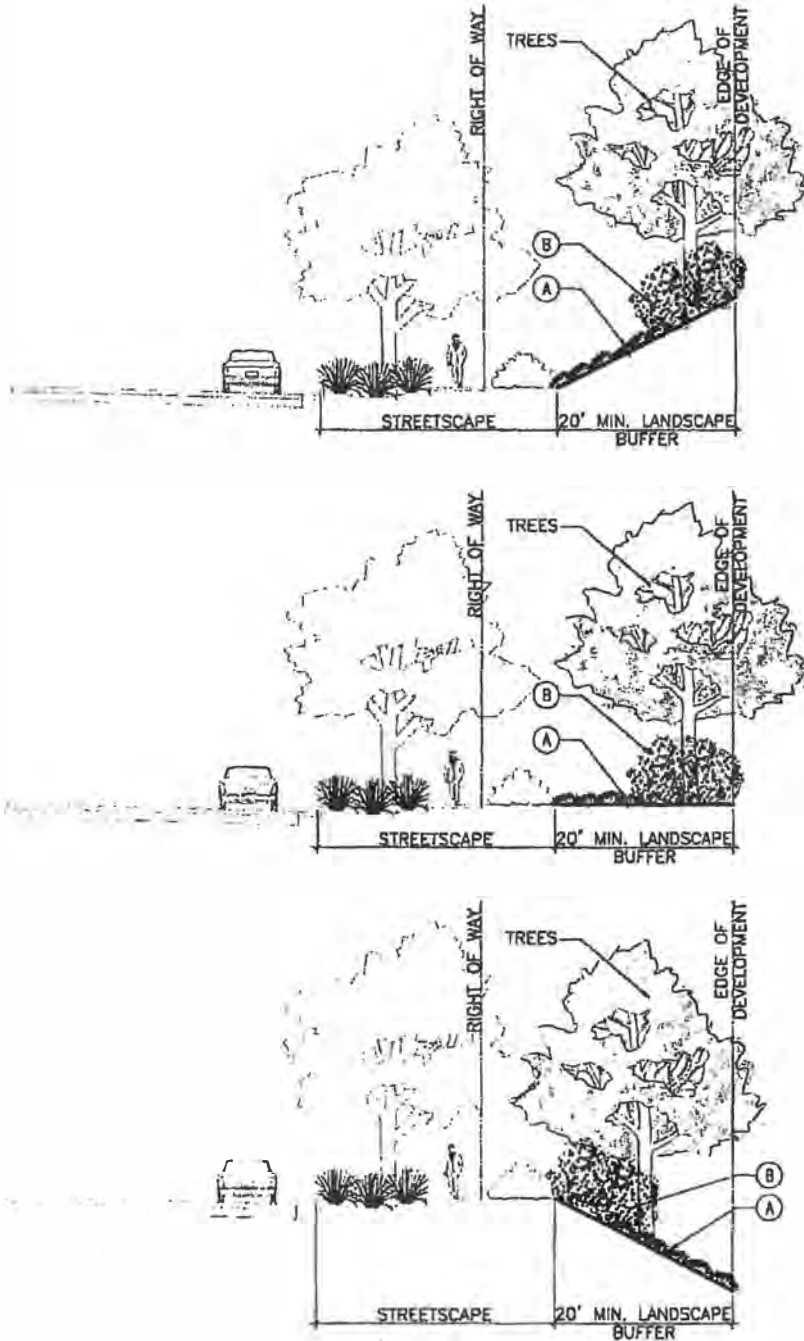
Slope Planting Guideline (From Top: Up-slope, Flat-slope, Down-slope)
